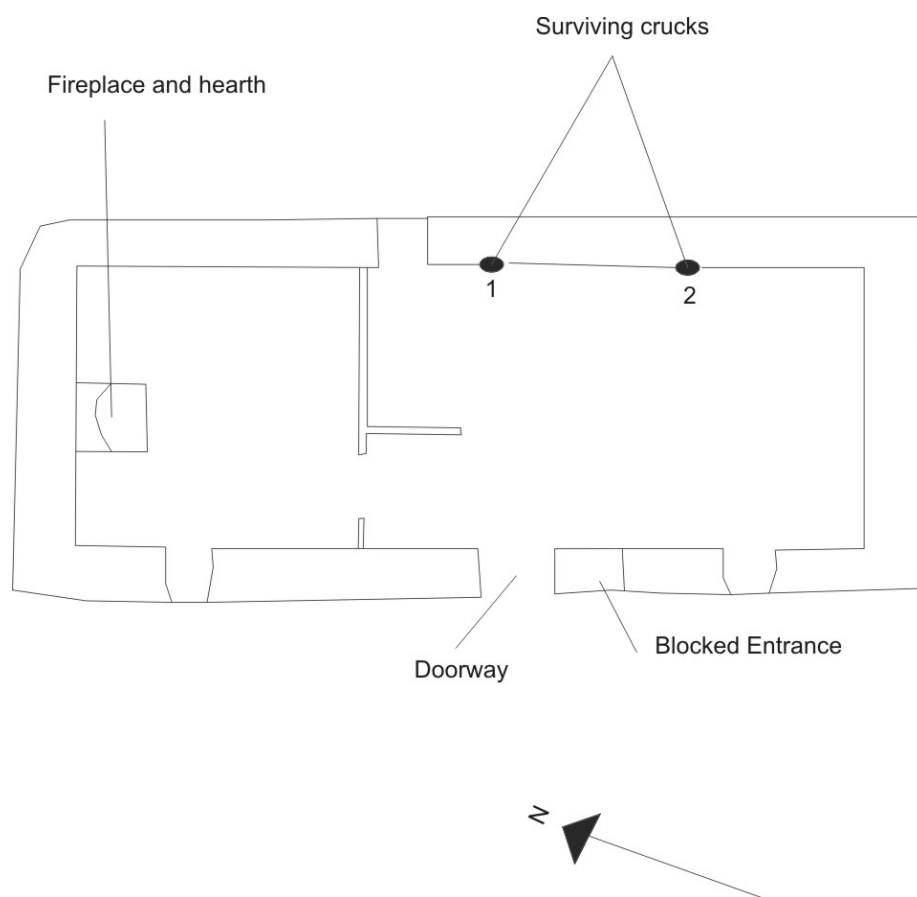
Ground plan of Building 1 showing location of crucks and fireplace Scale 1:100
